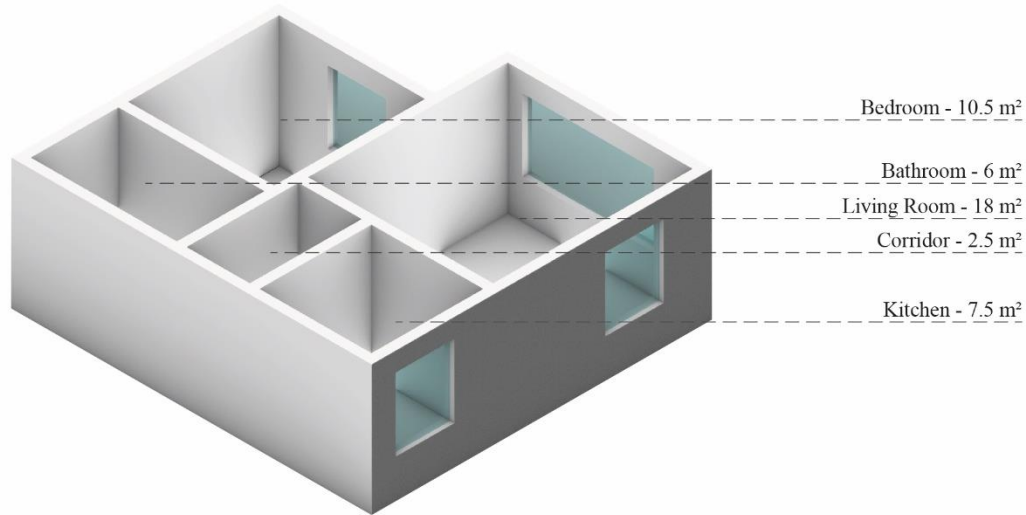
Isometric Plan Layout Representation of Case Study-I
